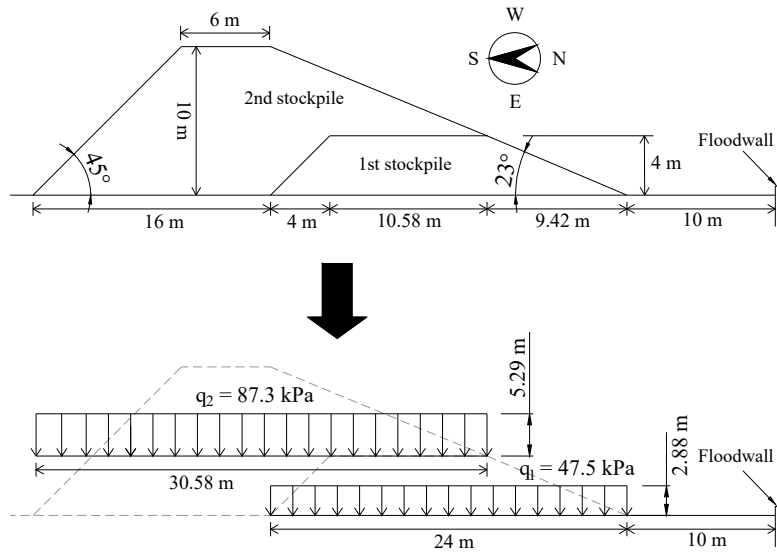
Cross-section of stockpile No.1 behind building 7.
